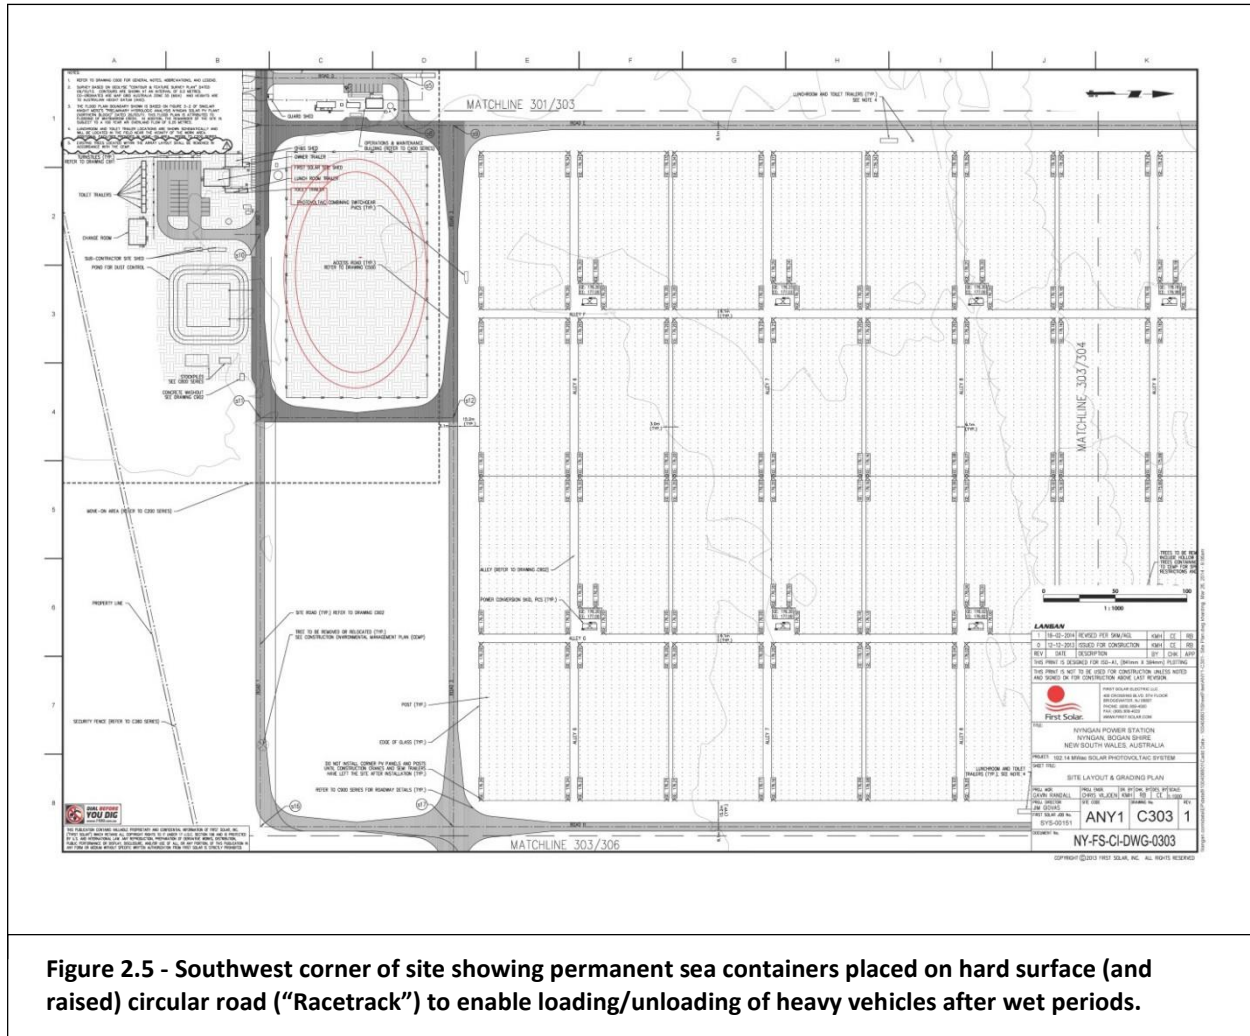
Southwest corner of site showing permanent sea containers placed on hard surface (and raised) circular road ("Racetrack") to enable loading/unloading of heavy vehicles after wet periods.
